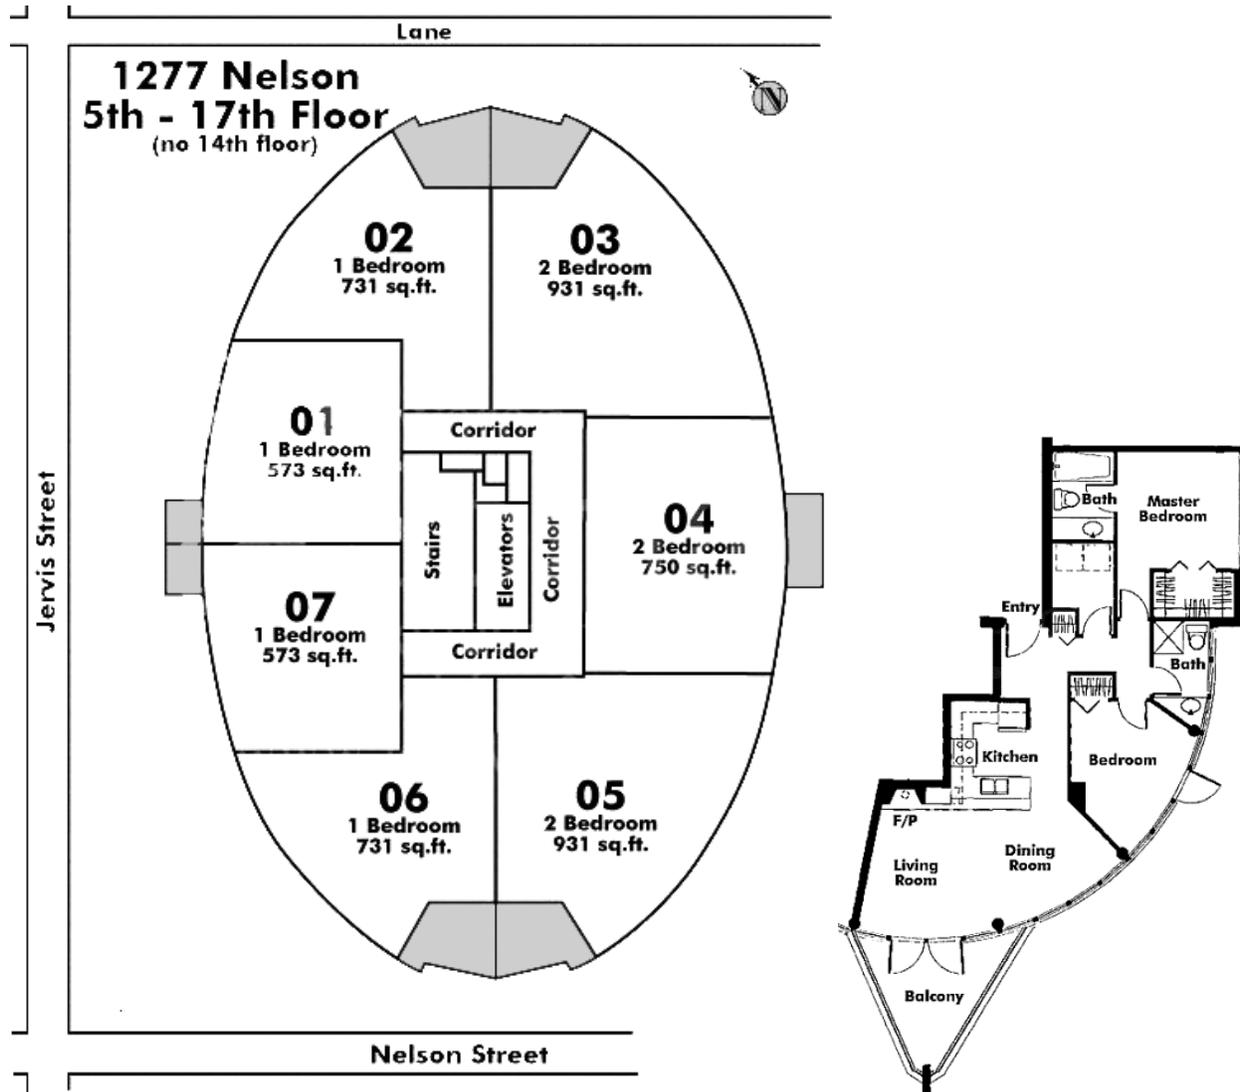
1277 Nelson Schematic floor plan floors 5-17, and detail plan from levels 18-20. (website of real estate agent Les Twarog). Notice that every unit has a balcony.
